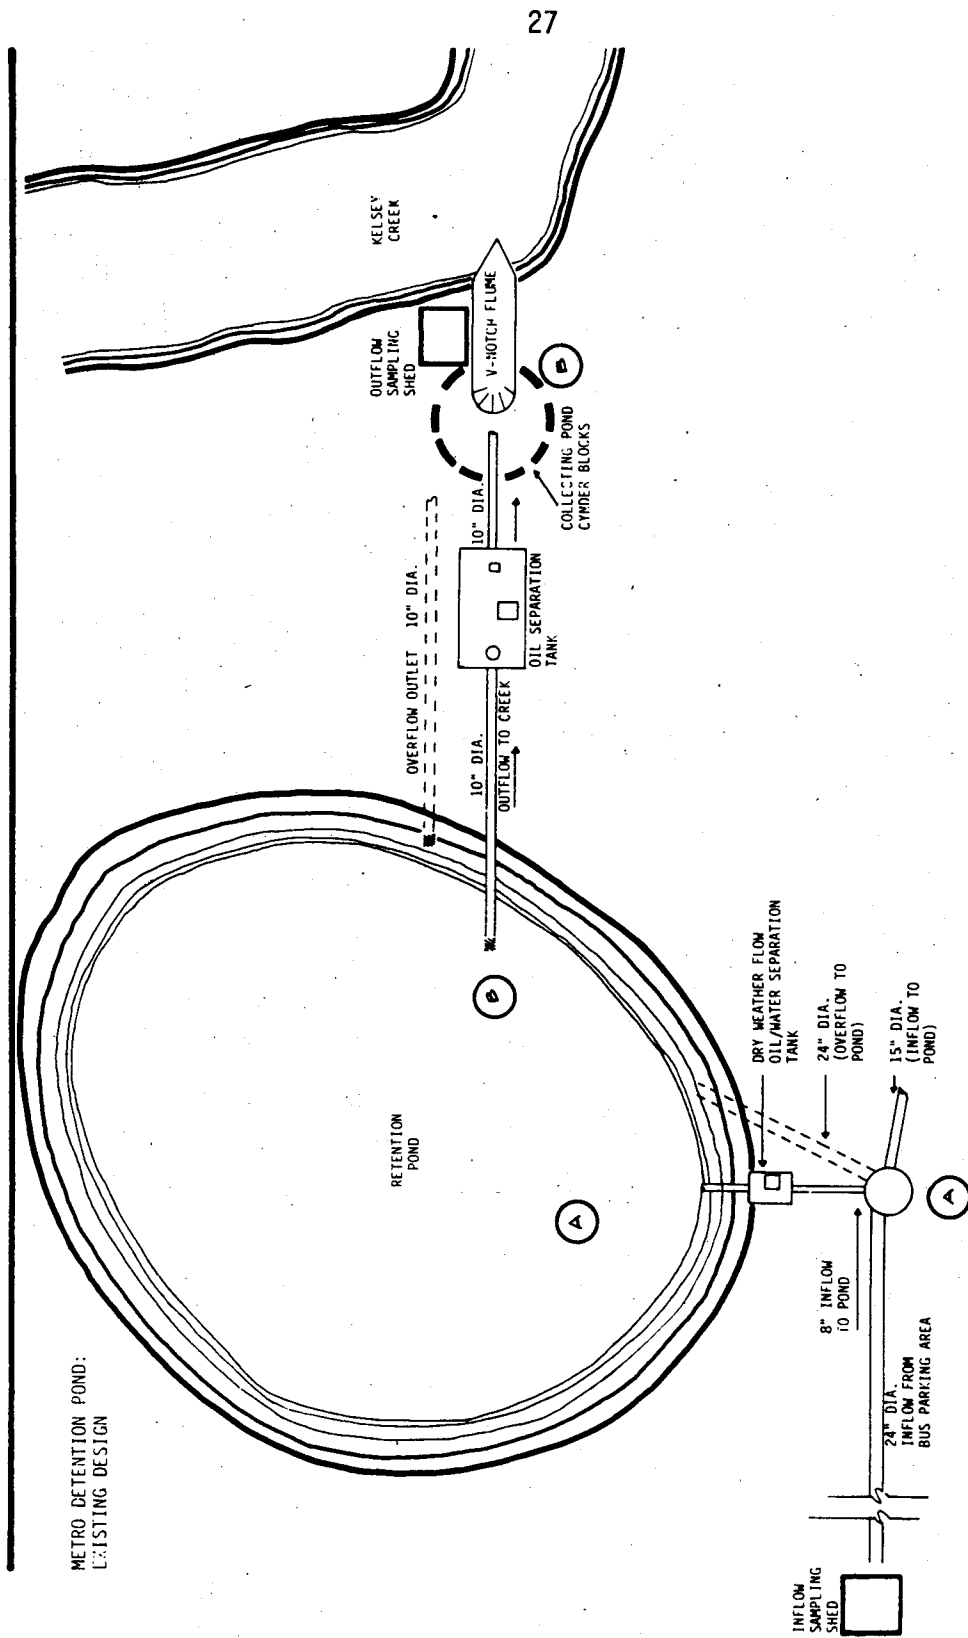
METRO Retention Pond and Surrounding Drainage System Site Plans. (Sections AA and BB refer to Figures 3.6 and 3.7).
